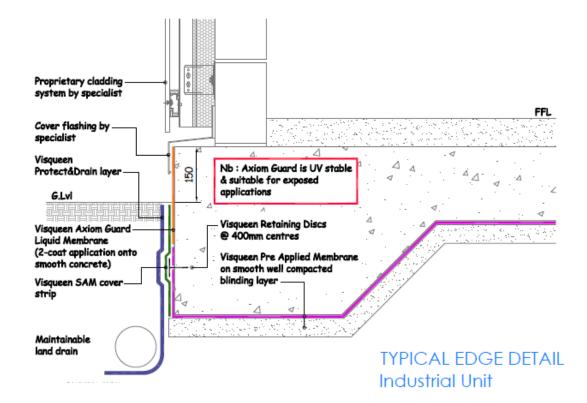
Ground bearing slab - typical perimeter concrete upstand detail
